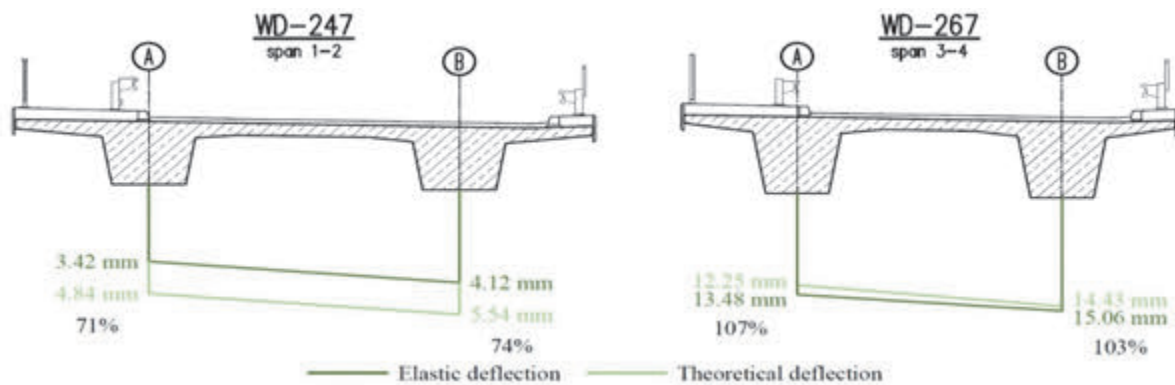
The deflections of girders for bridge WD247 (left side) and bridge WD267 (right side)
